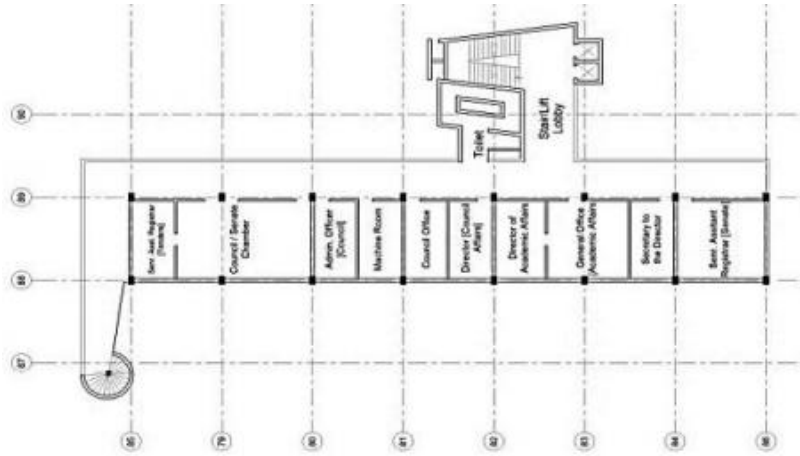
Fifth floor plan of OAU Senate Building (Source Author's Field work)
